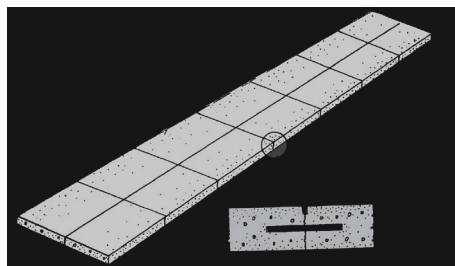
A pavement with dowels. The contraction joints are spaced closely together to control shrinkage cracking; there is no need for reinforcement between joints. Heavy wheel loads make the dowels necessary for load transfer at the joints.
